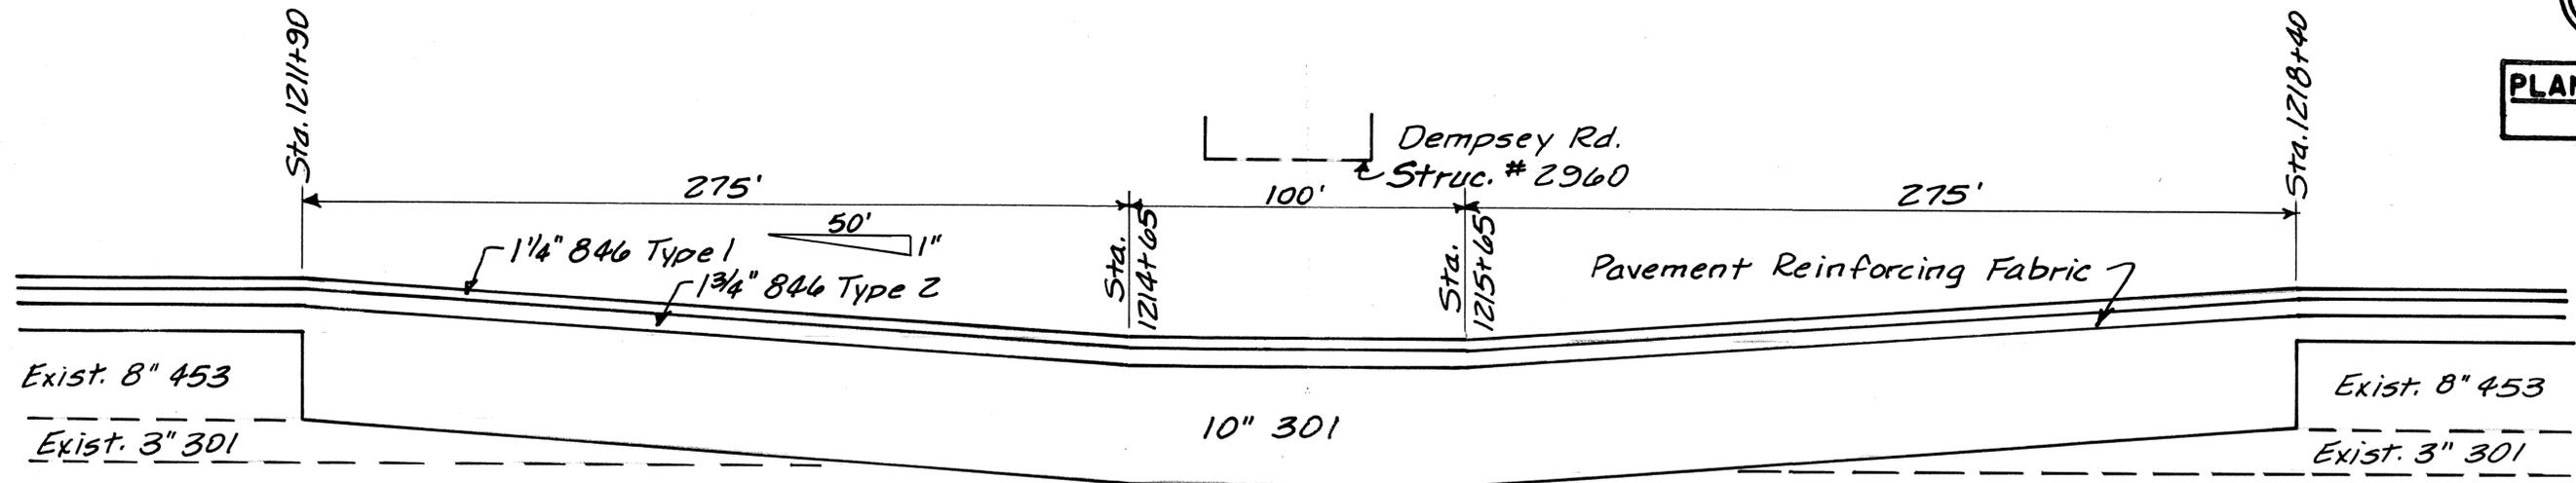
DETAIL AT TRANSITION FROM CONCRETE OVERLAY (Sec. B) TO FULL DEPTH REPLACEMENT
